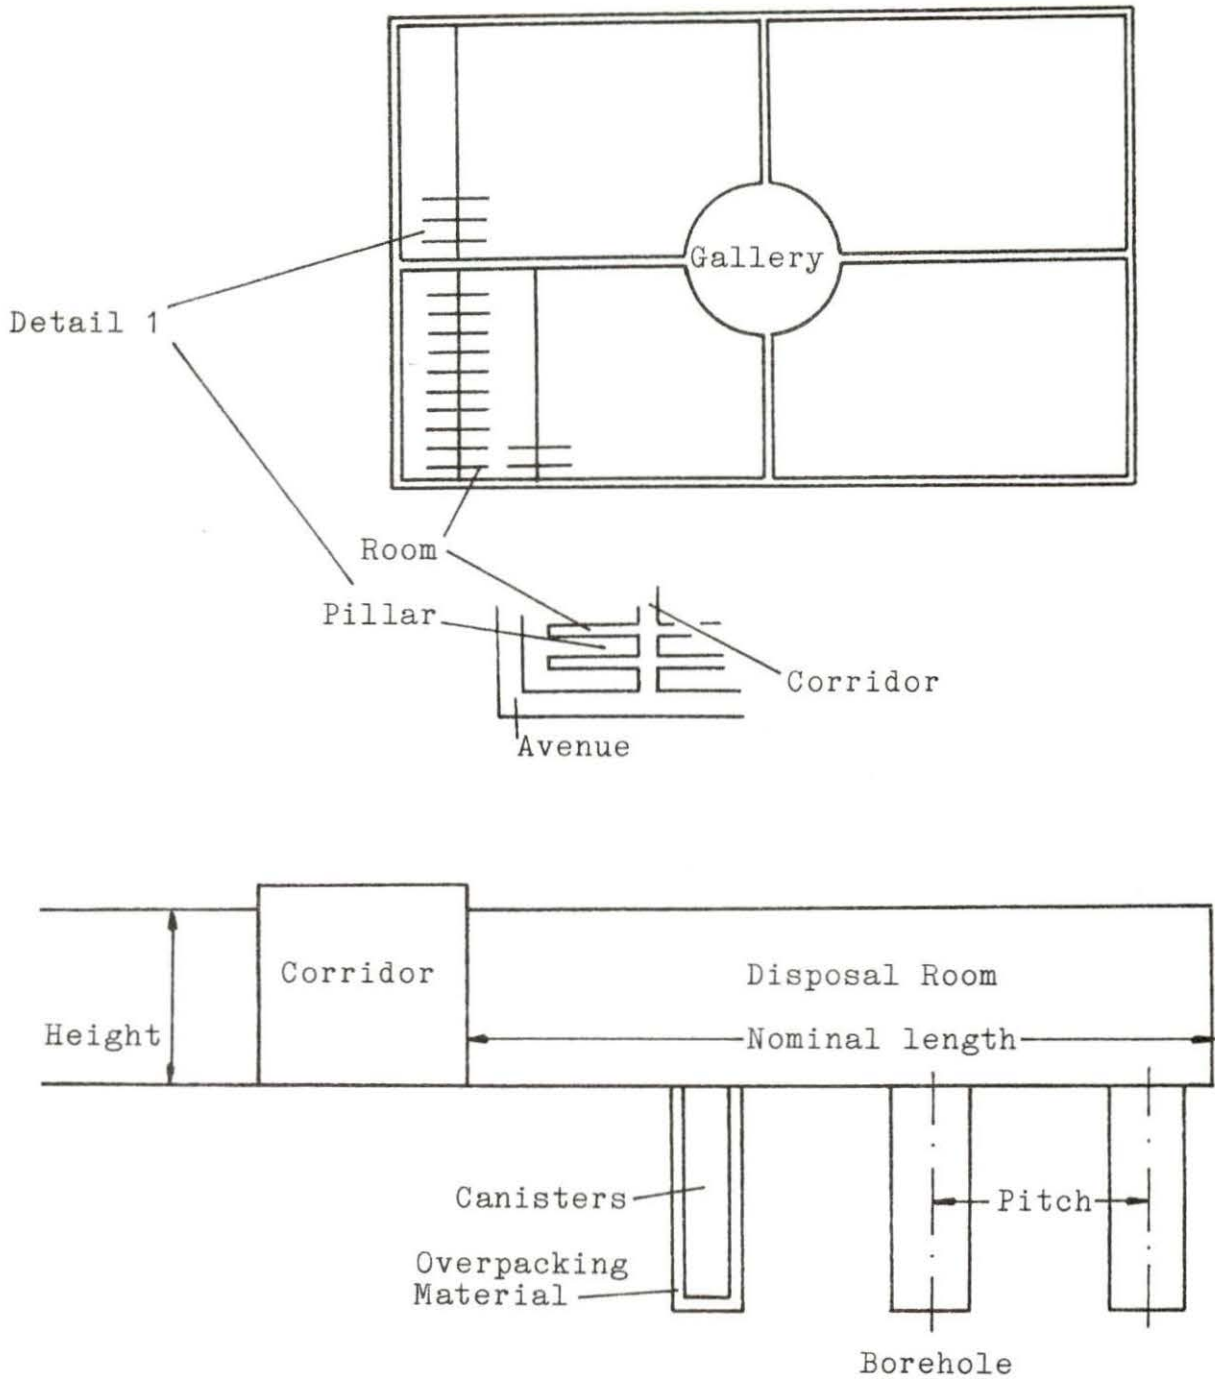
Plan view of the underground area of the repository and details of rooms and boreholes
